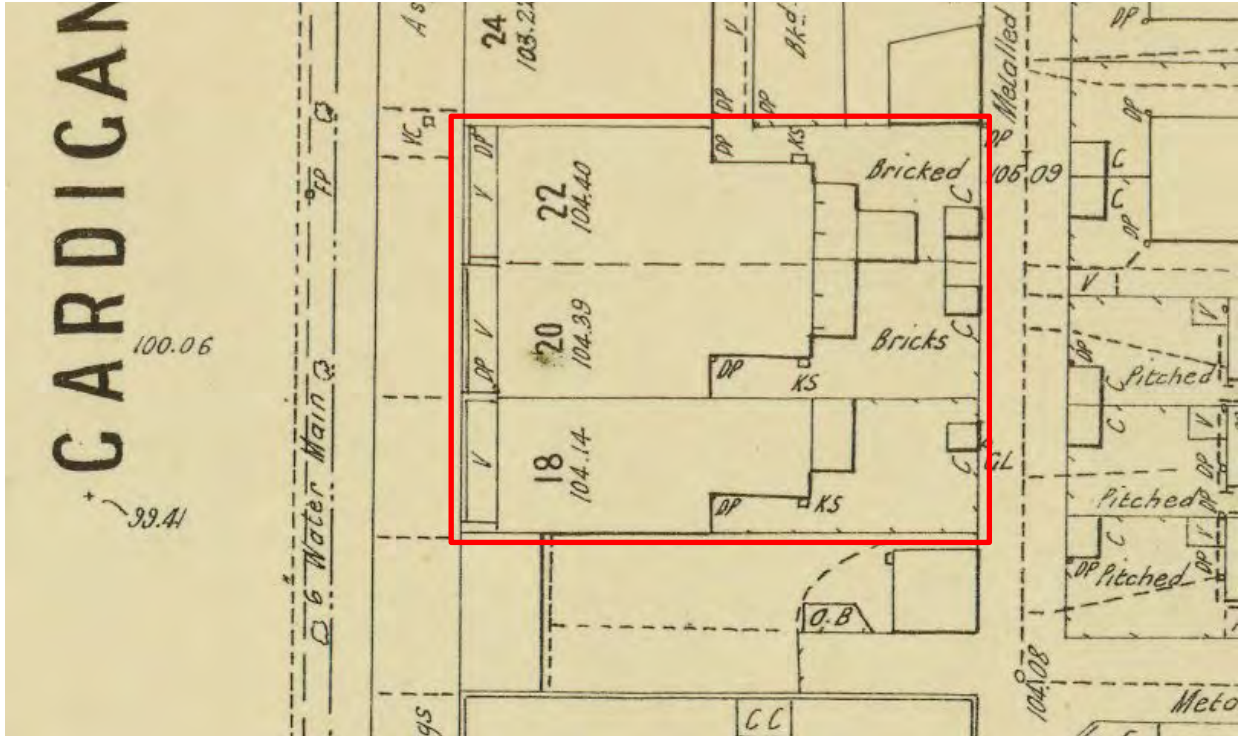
[Detail] MMBW detail plan no 1180 and 1181, 1896 showing the subject site
